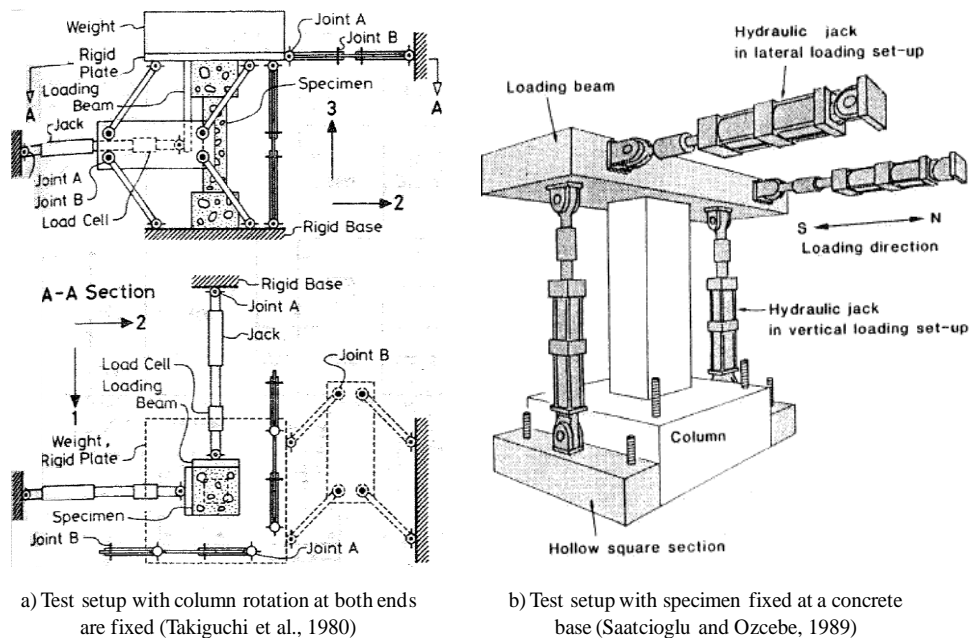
Typical test setups used for testing of column elements under bidirectional loading
